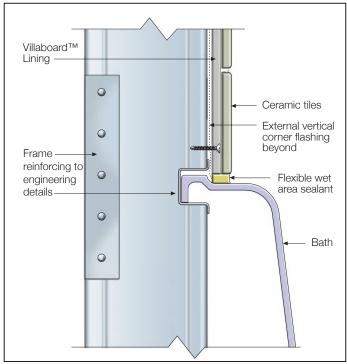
B BATH EDGE DETAIL - VILLABOARD™ LINING TO BE FINISHED WITH TILES - STEEL FRAME
